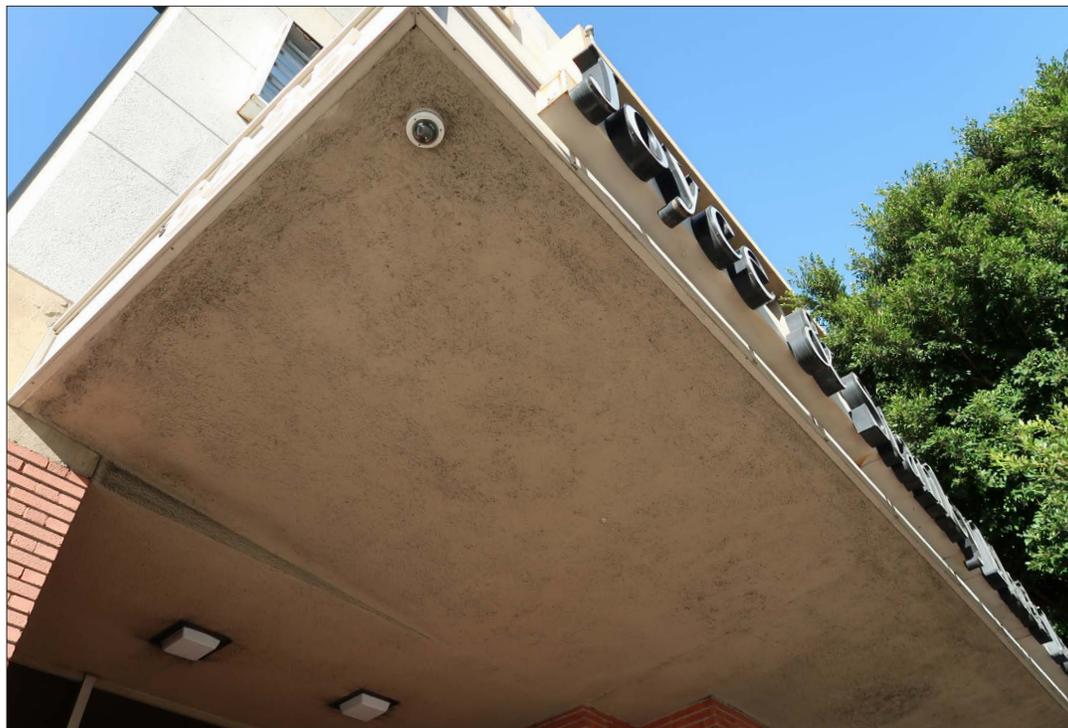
South elevation, canopy at main entrance, view northeast (Chattel, 2019)
